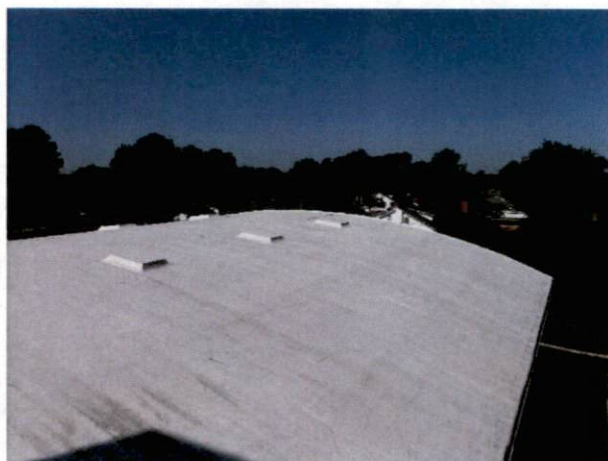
View of HA 26, non-asbestos containing white coating over silver paint with built-up roofing.
